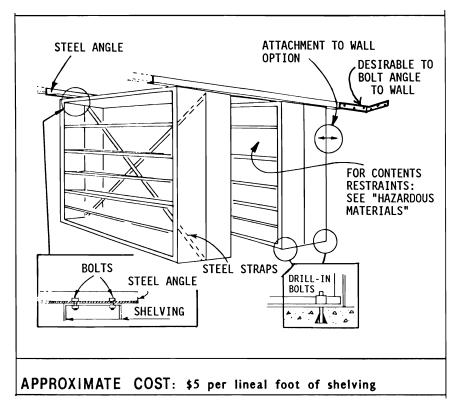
Tall shelving should be stabilized by connecting units rigidly to each other or anchoring them to walls.
